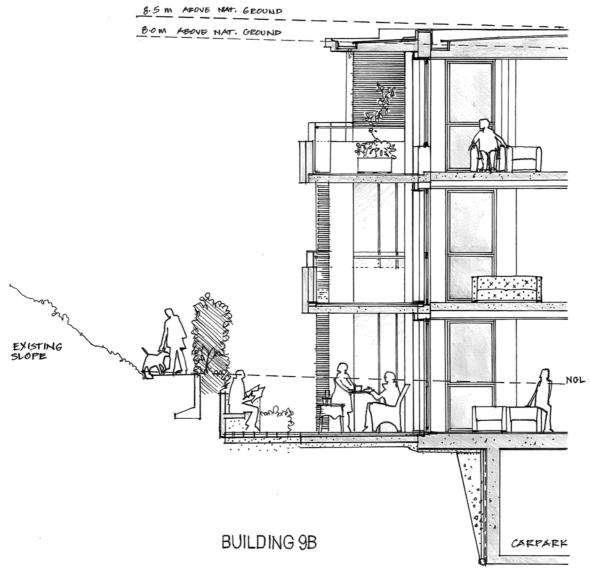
Building 9B – Section looking west with embankment to Castle Hill Road.
